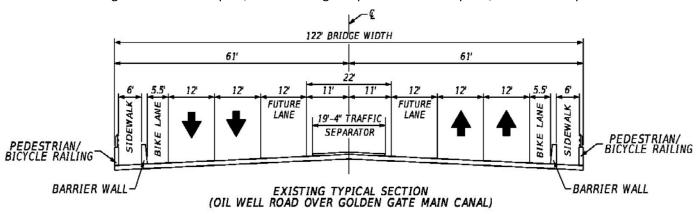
Existing Bridge Typical Section - Oil Well Road Over Golden Gate Canal
